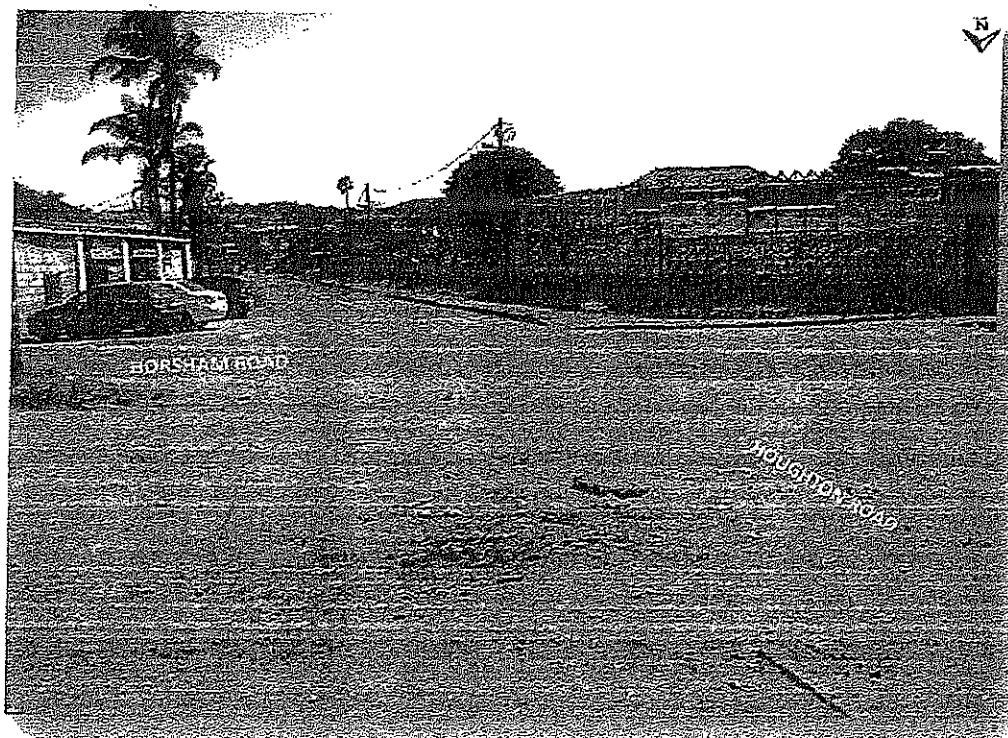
Intersection of Horsham Road and Houghton Road facing south
